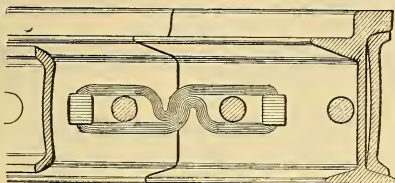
Showing 7-inch Girder Rail, bonded with one Bond.
